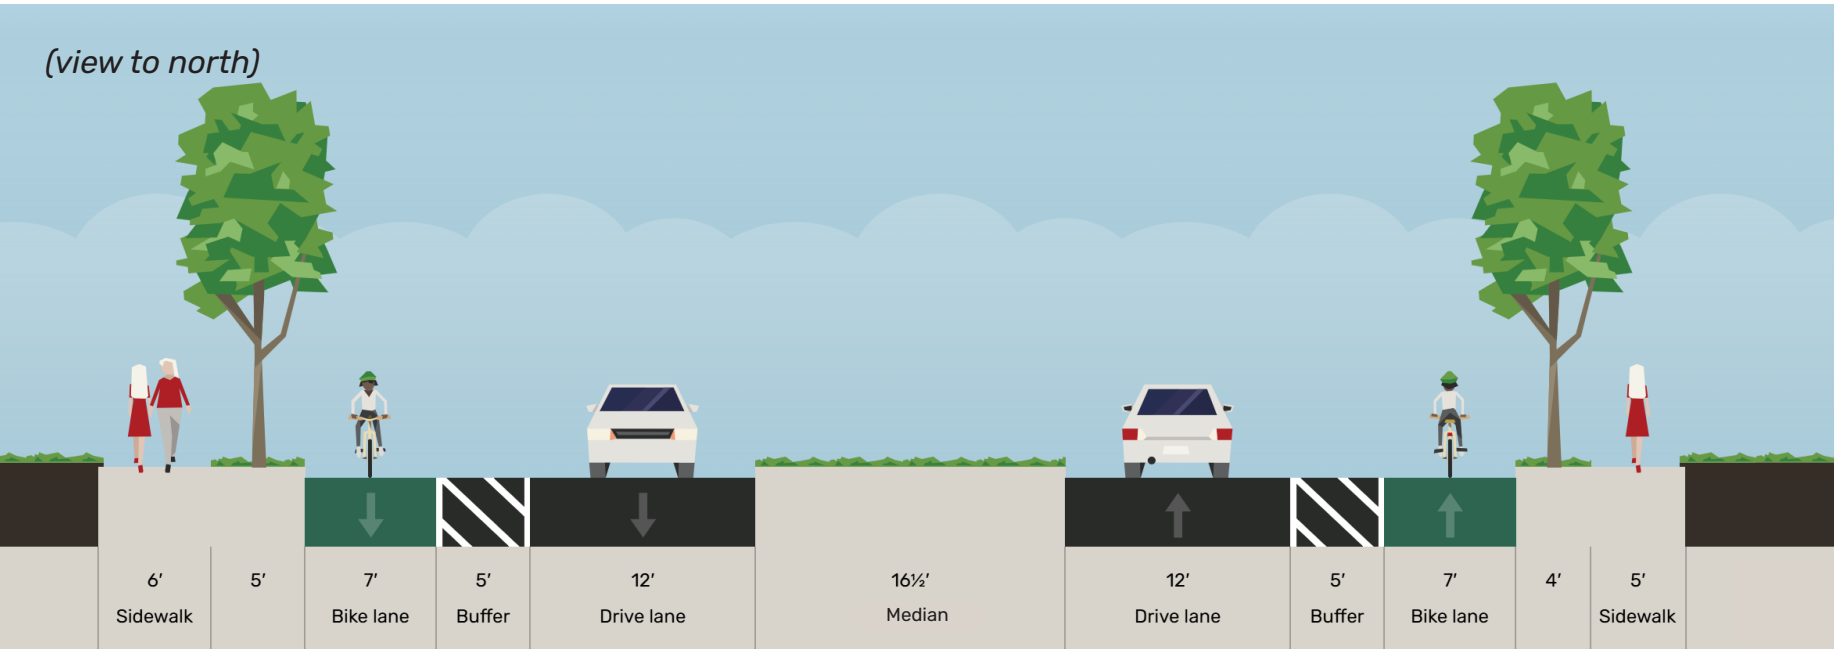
Proposed Typical Cross-Section on Corinth Parkway (West of IH 35) (84' ROW)
